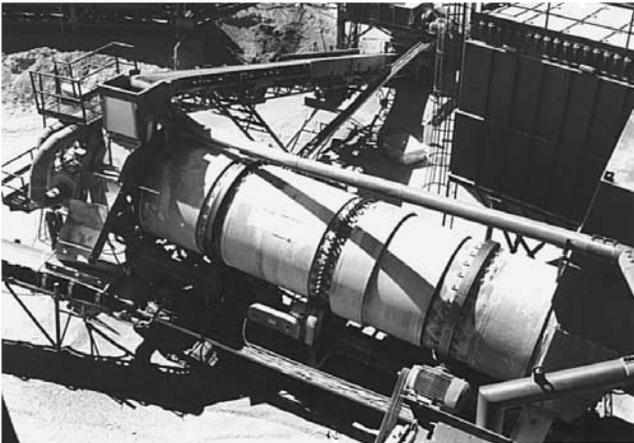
Dayton hot-mix plant—drum heating and mixing.
